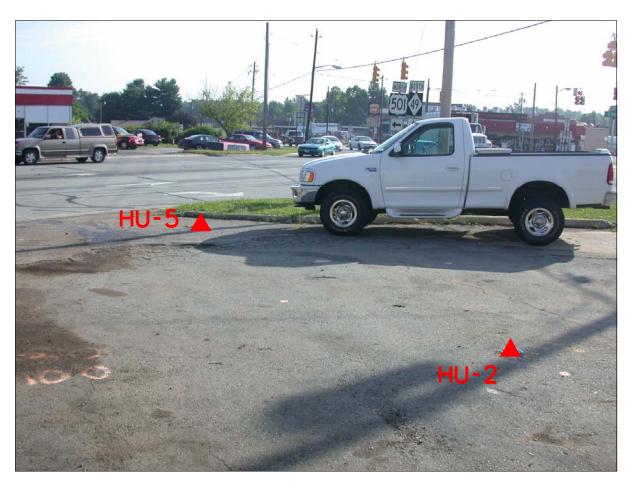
BORINGS AT HUMPHRIES PROPERTY LOOKING NORTH FROM BUILDING
